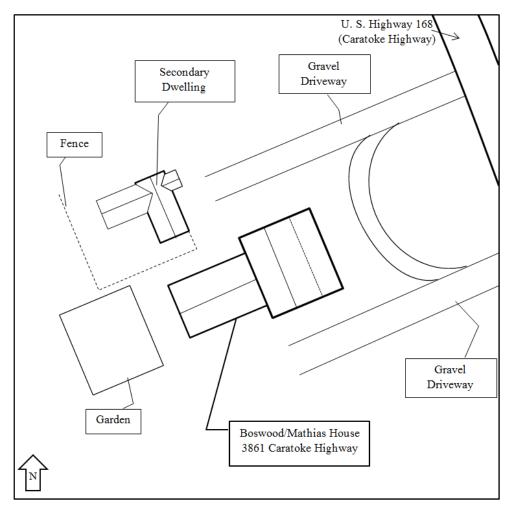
Site Plan of the Boswood/Mathias House, Not Drawn to Scale.
